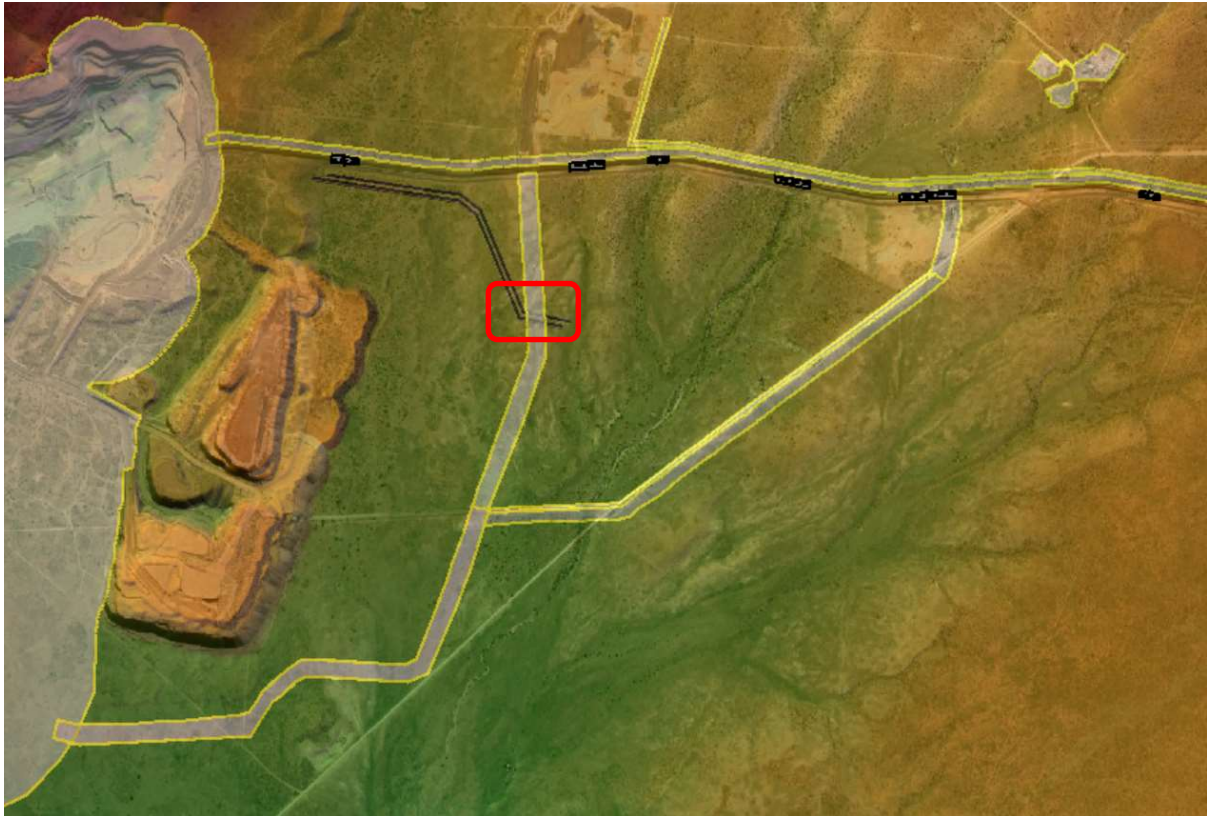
Proipposed diversion channel – New Haul Road crossing
